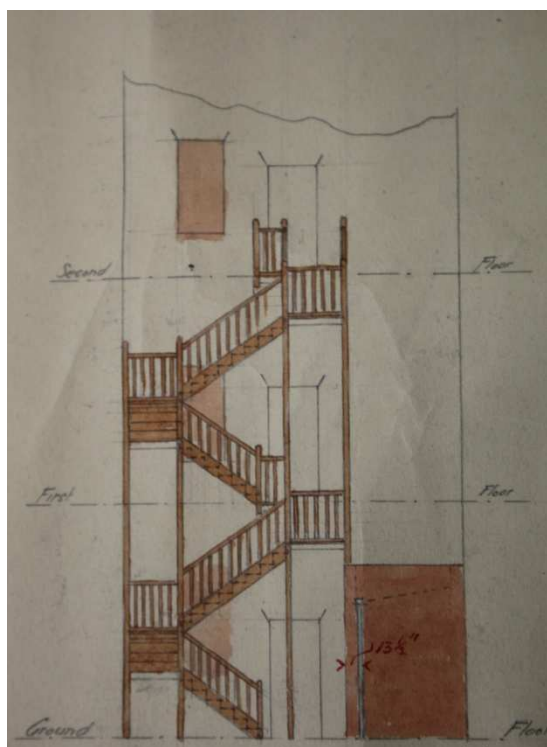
Beaver & Purnell, Rear 132 Lt Lonsdale St 1920 (MCC Building Application at VPRO)
